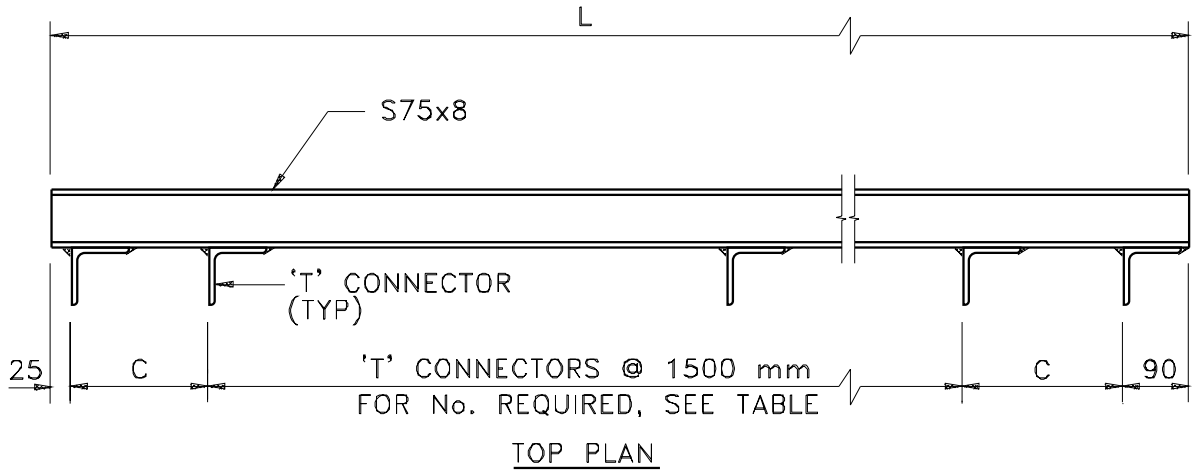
Lower Steel Crossarm Details (Extended Type)
